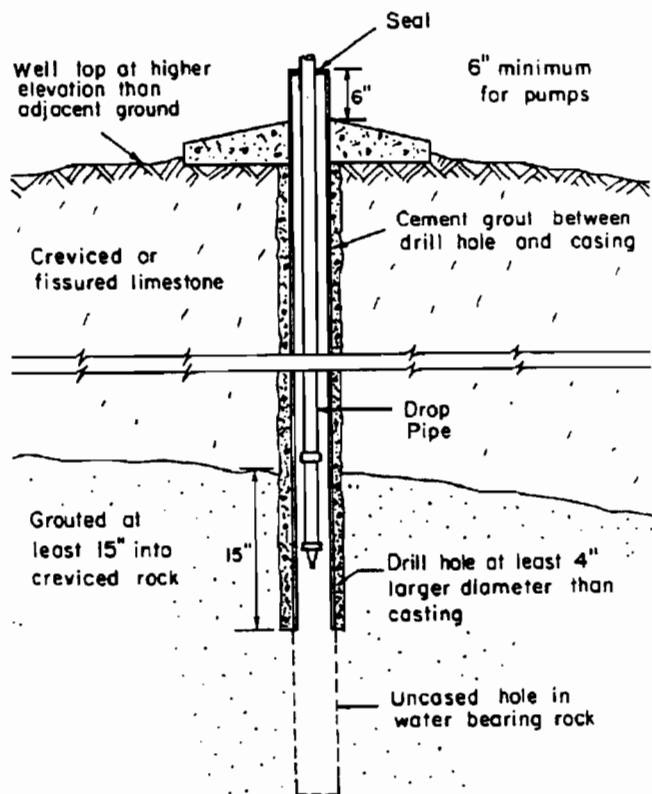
Proper construction of a drilled well obtaining water from rock [1].
